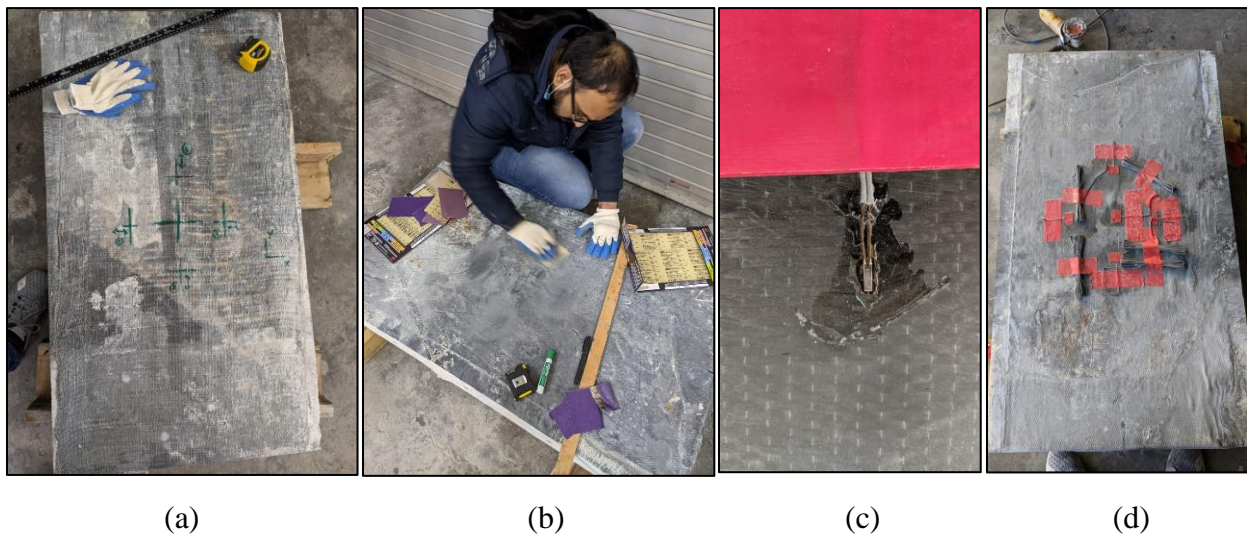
Installation of CFRP strain gauges (a) Marking the location of strain gauge (b) abrasion of CFRP surface using sandpaper (c) CFRP strain gauge installed (d) Tape covering for protection purpose
